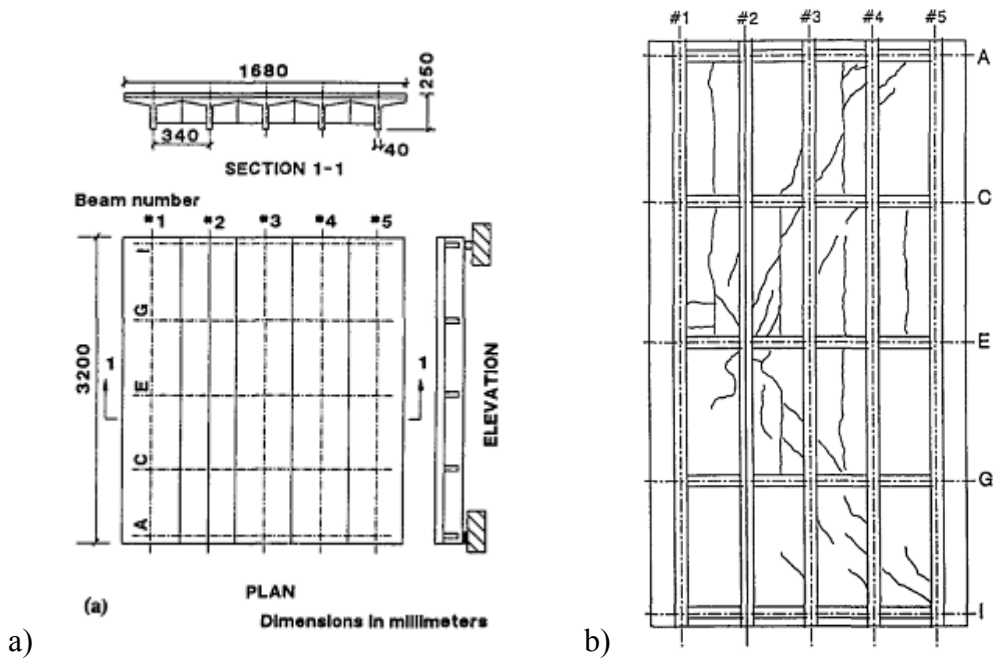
Model bridge deck studied by Law et al. (1995): a) plan view, elevation and section; b) underside view of crack pattern of the deck.
